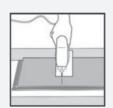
Cut with a jig saw - hardwood turned down to eliminate/ reduce damage to the face of the panel. Or if cutting using a hand saw, cut it with the hardwood visible face up. Then install it as previous plank.
